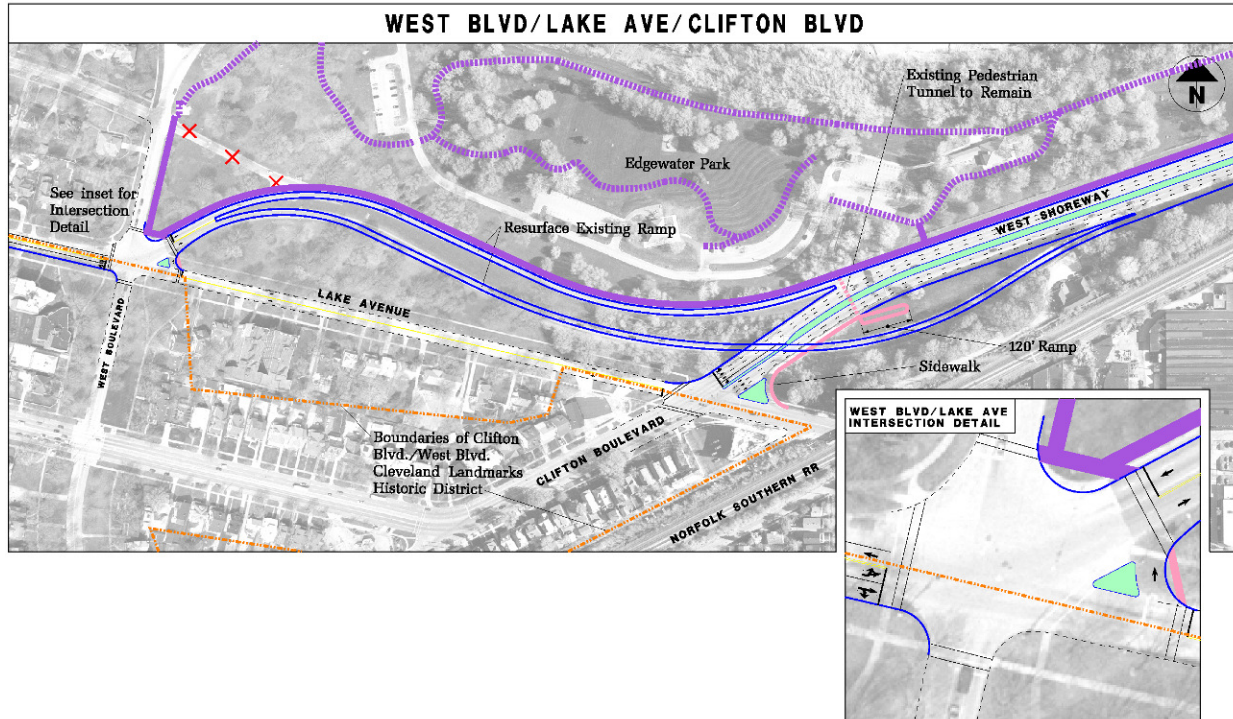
West Shoreway Boulevard Proposed West Blvd./Lake Ave/Clifton Blvd. Realignment
